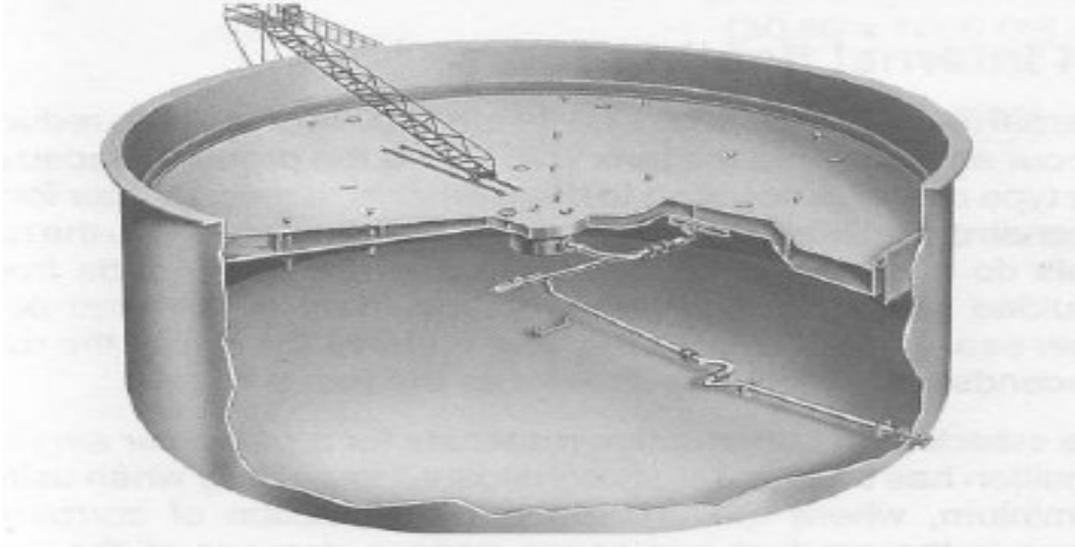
Single Deck Pontoon Type Floating Roof [Bob. L & Bob. G, n.d, p.155]
